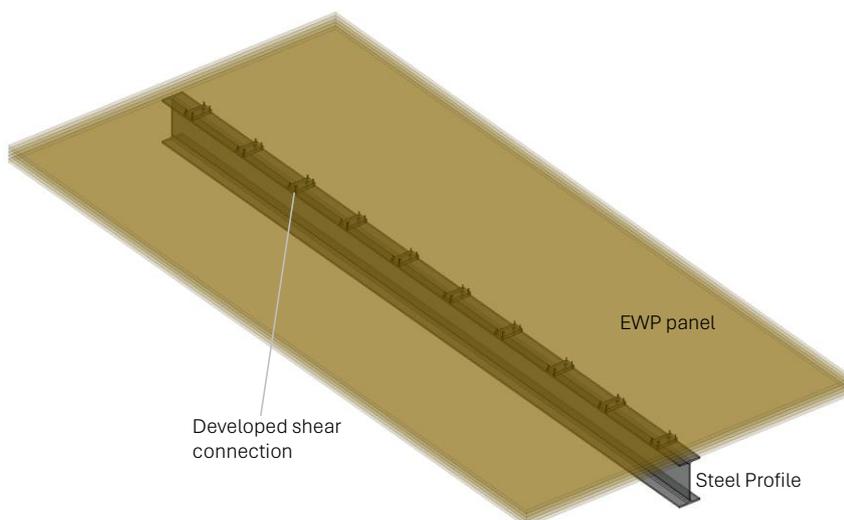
Steel-timber composite floor beam implementing the developed shear connection (*Patent application pending*)
